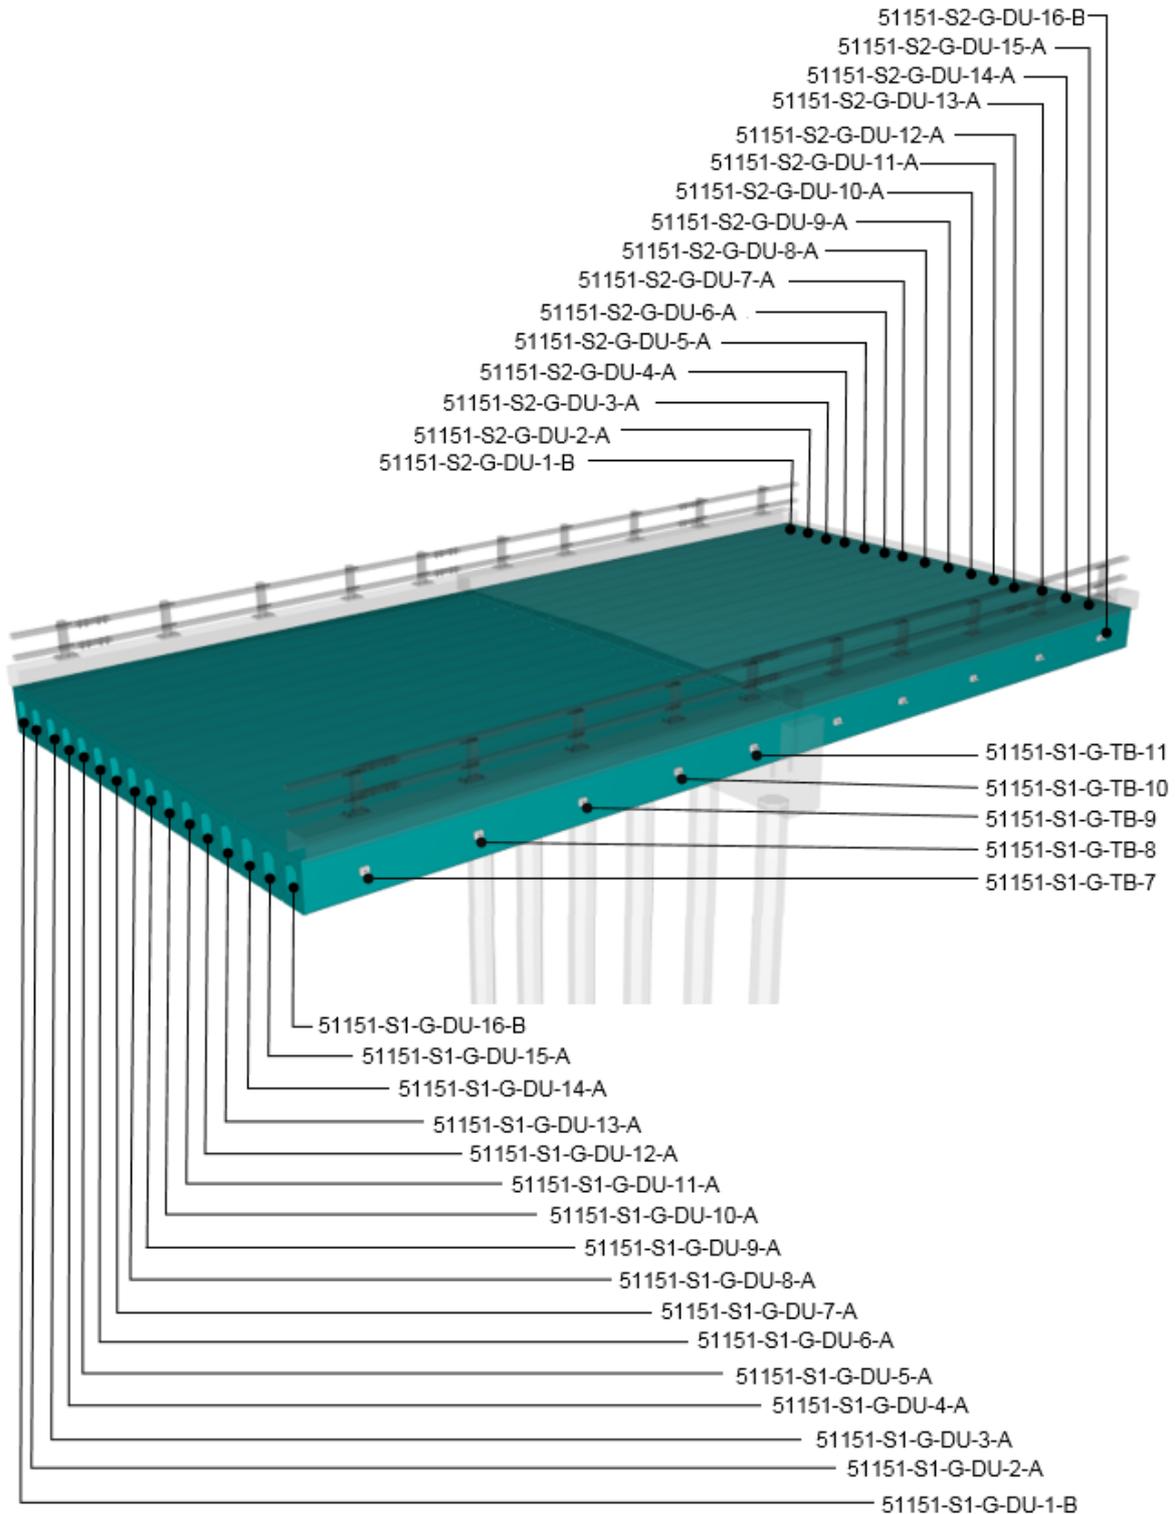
(b) – Naming convention for concrete girder (Super-T) objects
